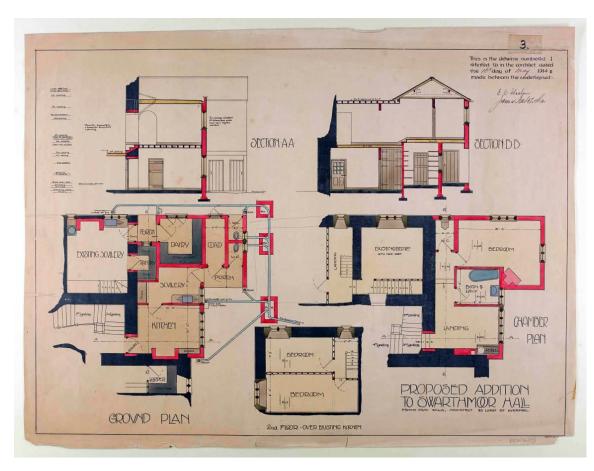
partial floor plans showing rear north-west extension, 1912, by Alfred Gray Wallis (Cumbria Archives, Ref BDSUD PLANS 1241 3b). North is to the right.
